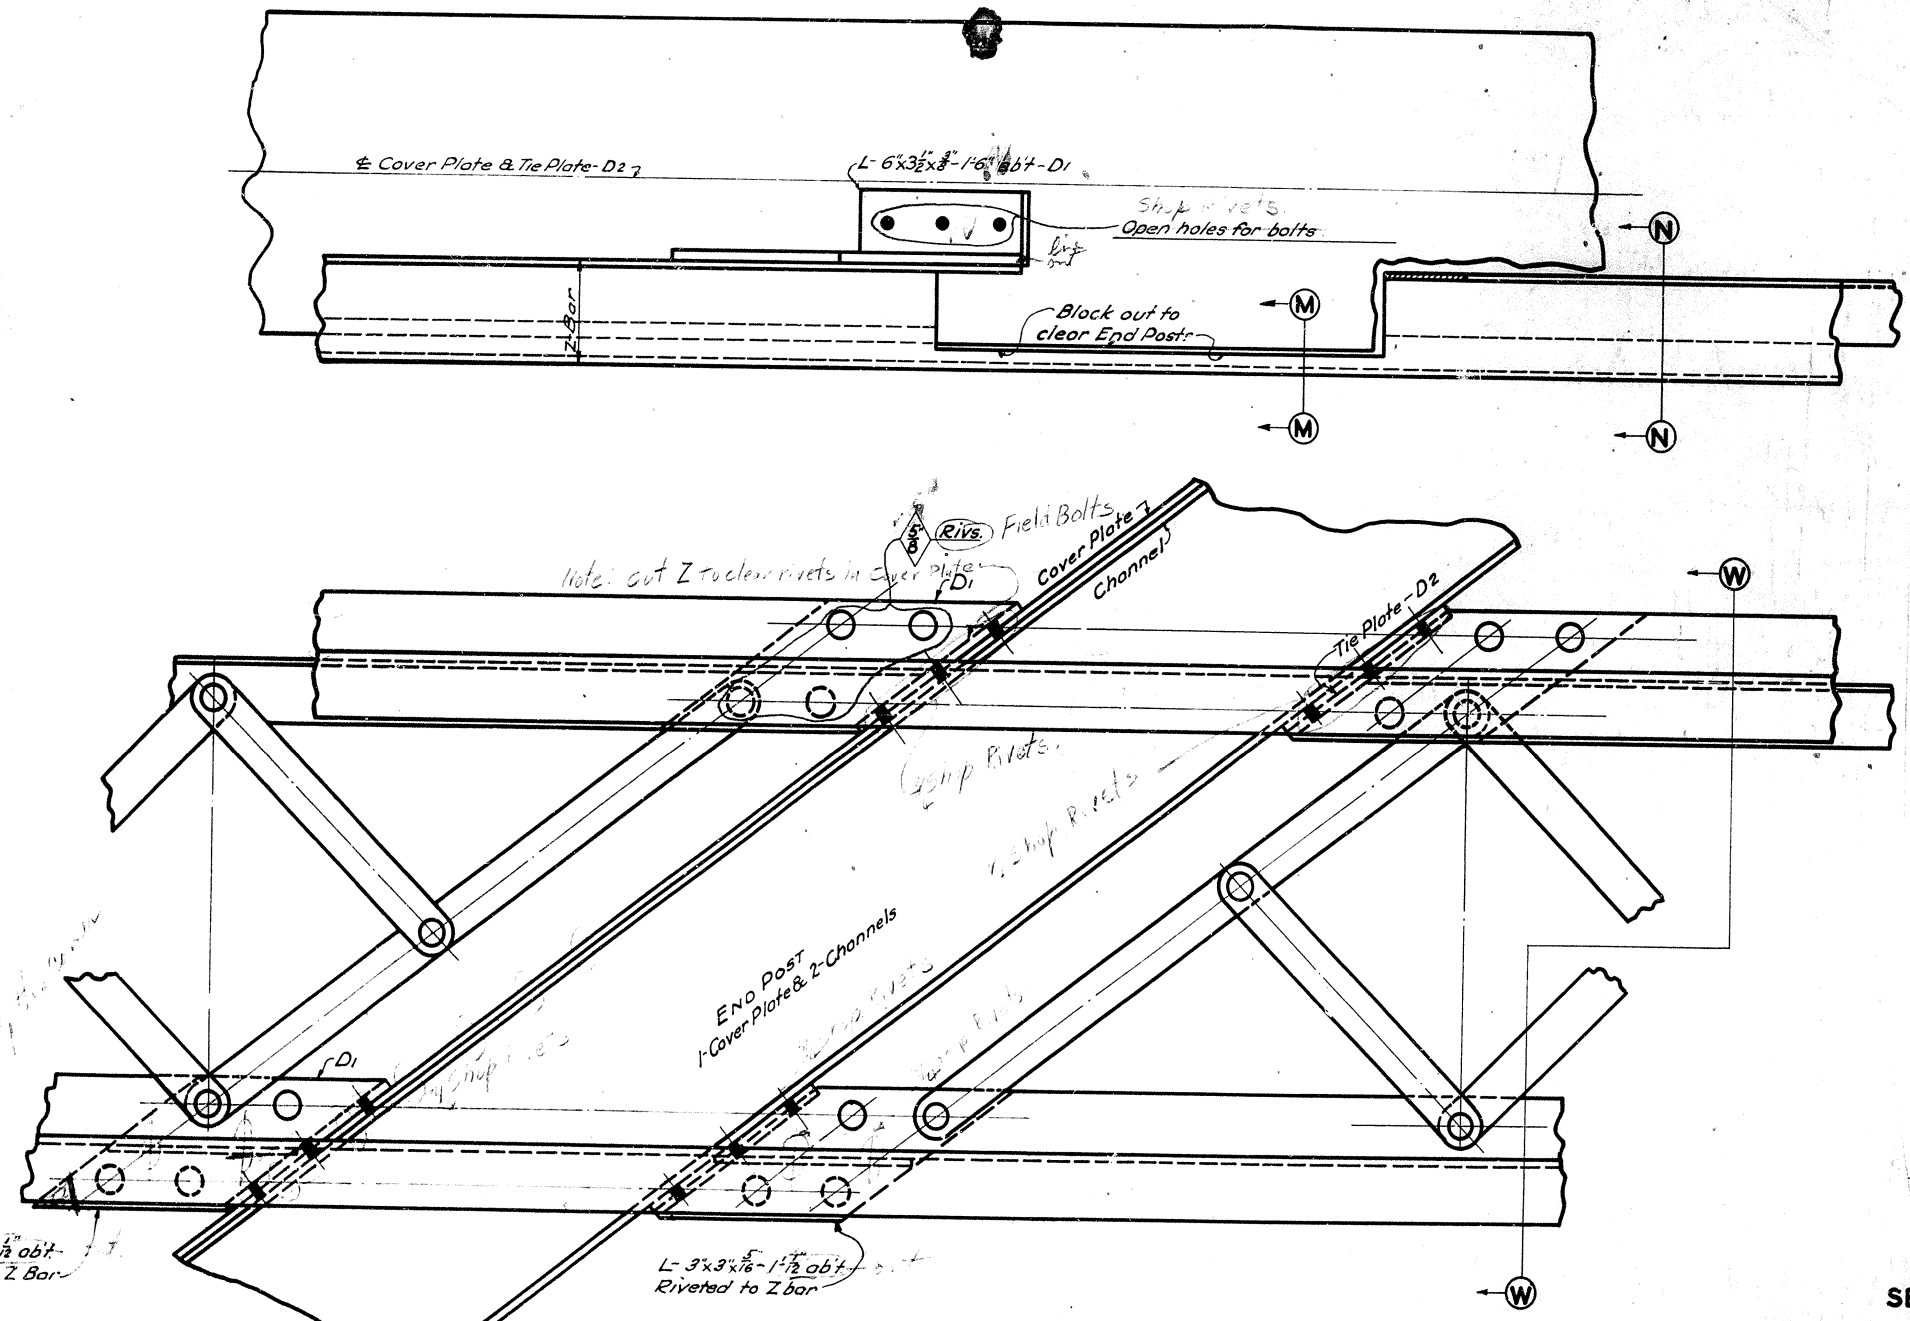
DETAIL OF EXPANSION ANGLE ON PARAPET WALL AT END OF STEEL SPANS
